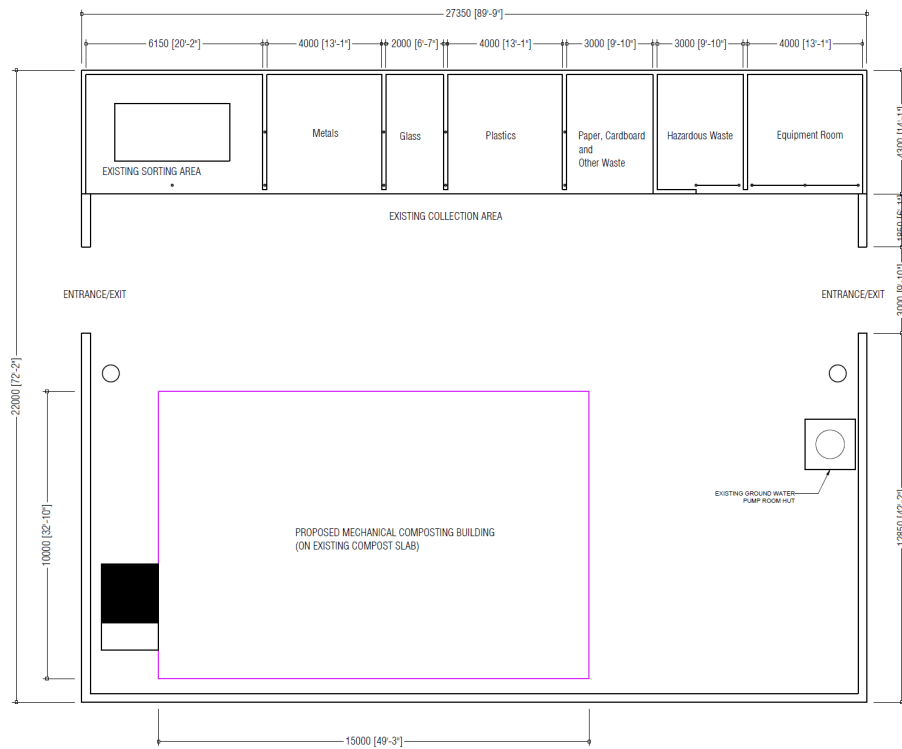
Site layout of the existing IWRMC showing the proposed mechanical composting building area (pink outline) (large scale drawing given in Appendix 3)
